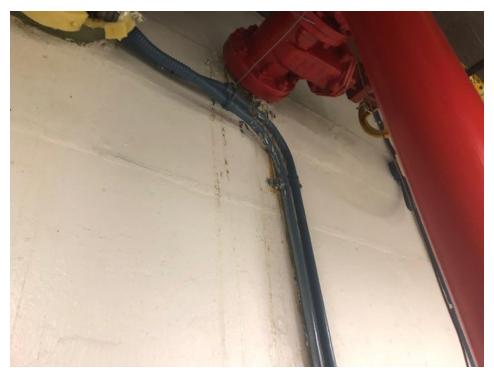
New Foundation Wall Stain in Fire Pump Room (February 7, 2019)
